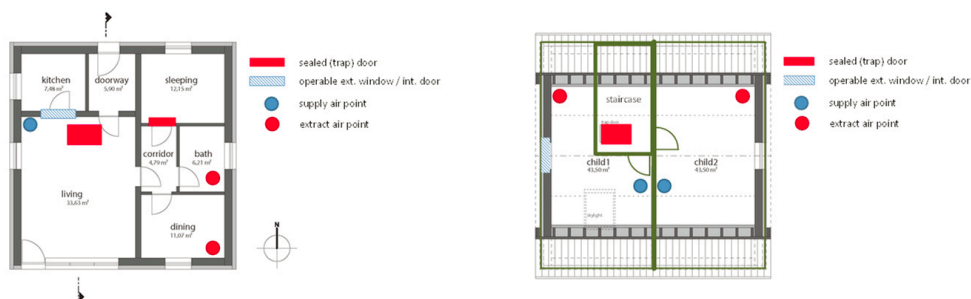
Floor plans of the twin houses including mechanical ventilation and operable openings
